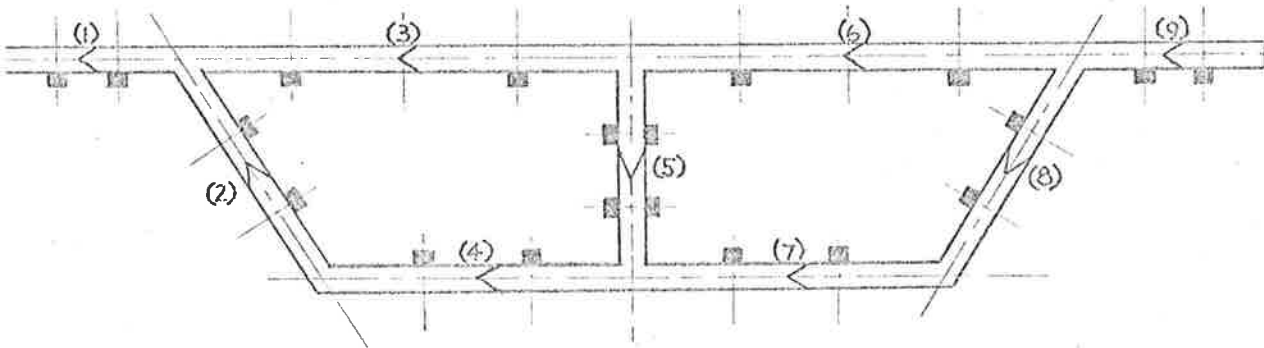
Instrumented 35° cross section of diaphragm structure
